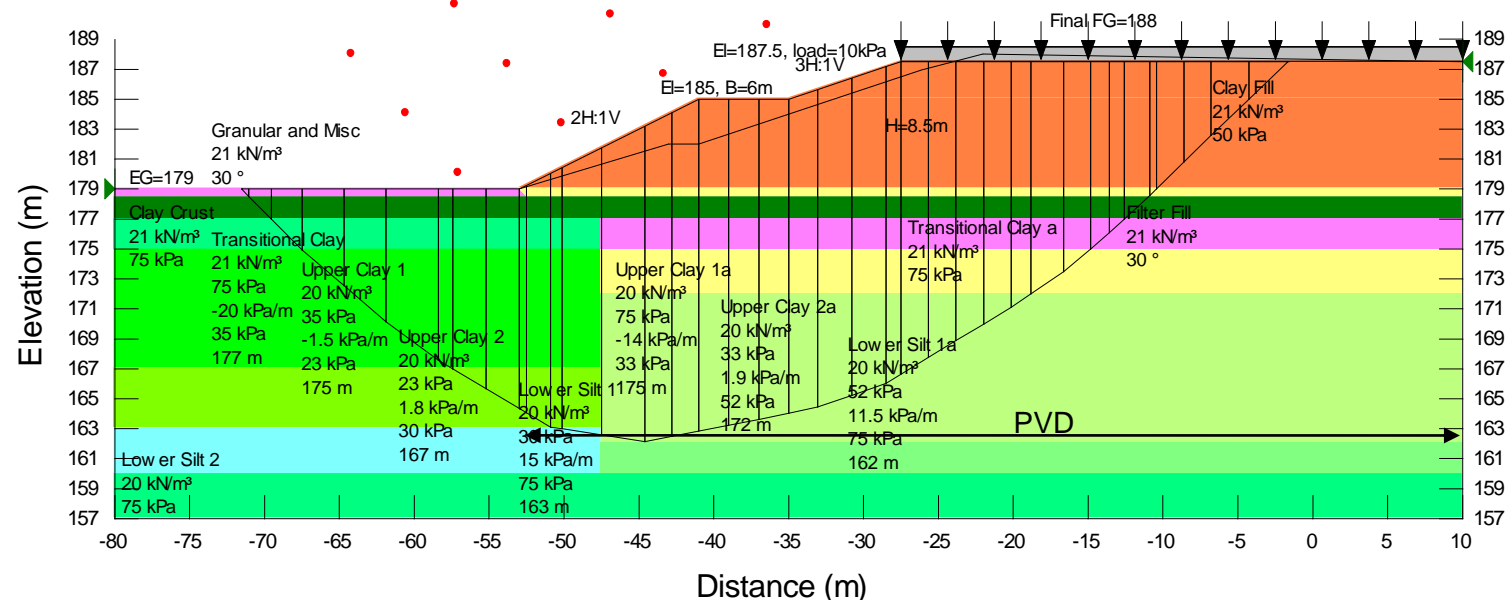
Slope Stability Result – Section 2 (Sta. 10+600W) – Stage 3 (EI=189.0) – Short-term Loading
